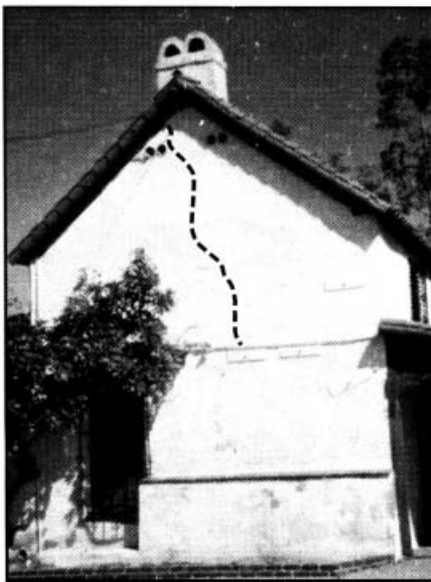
Andres Pico Adobe. Gable-end wall in 1991 before the Northridge earthquake. Preexisting cracks are indicated by dotted line.
